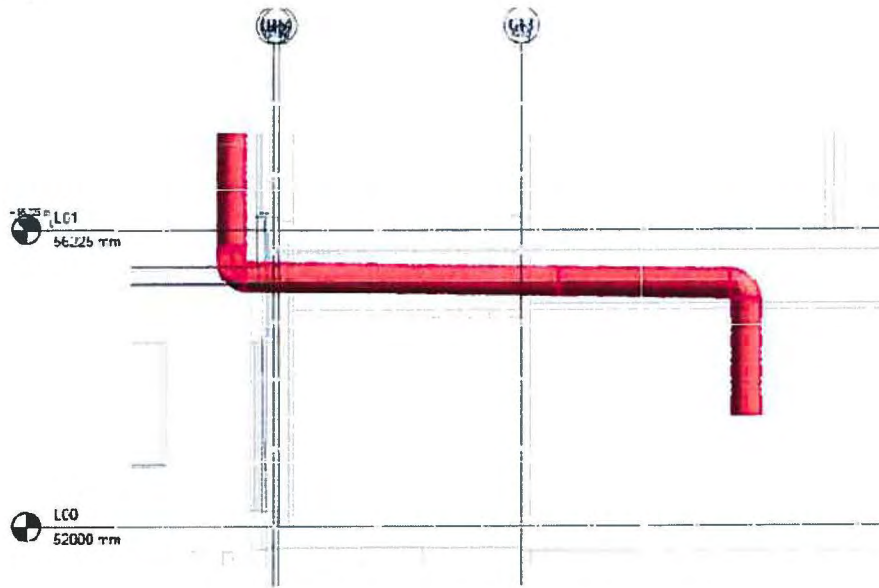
Quench Pipe Section through Corridor Route to Courtyard
